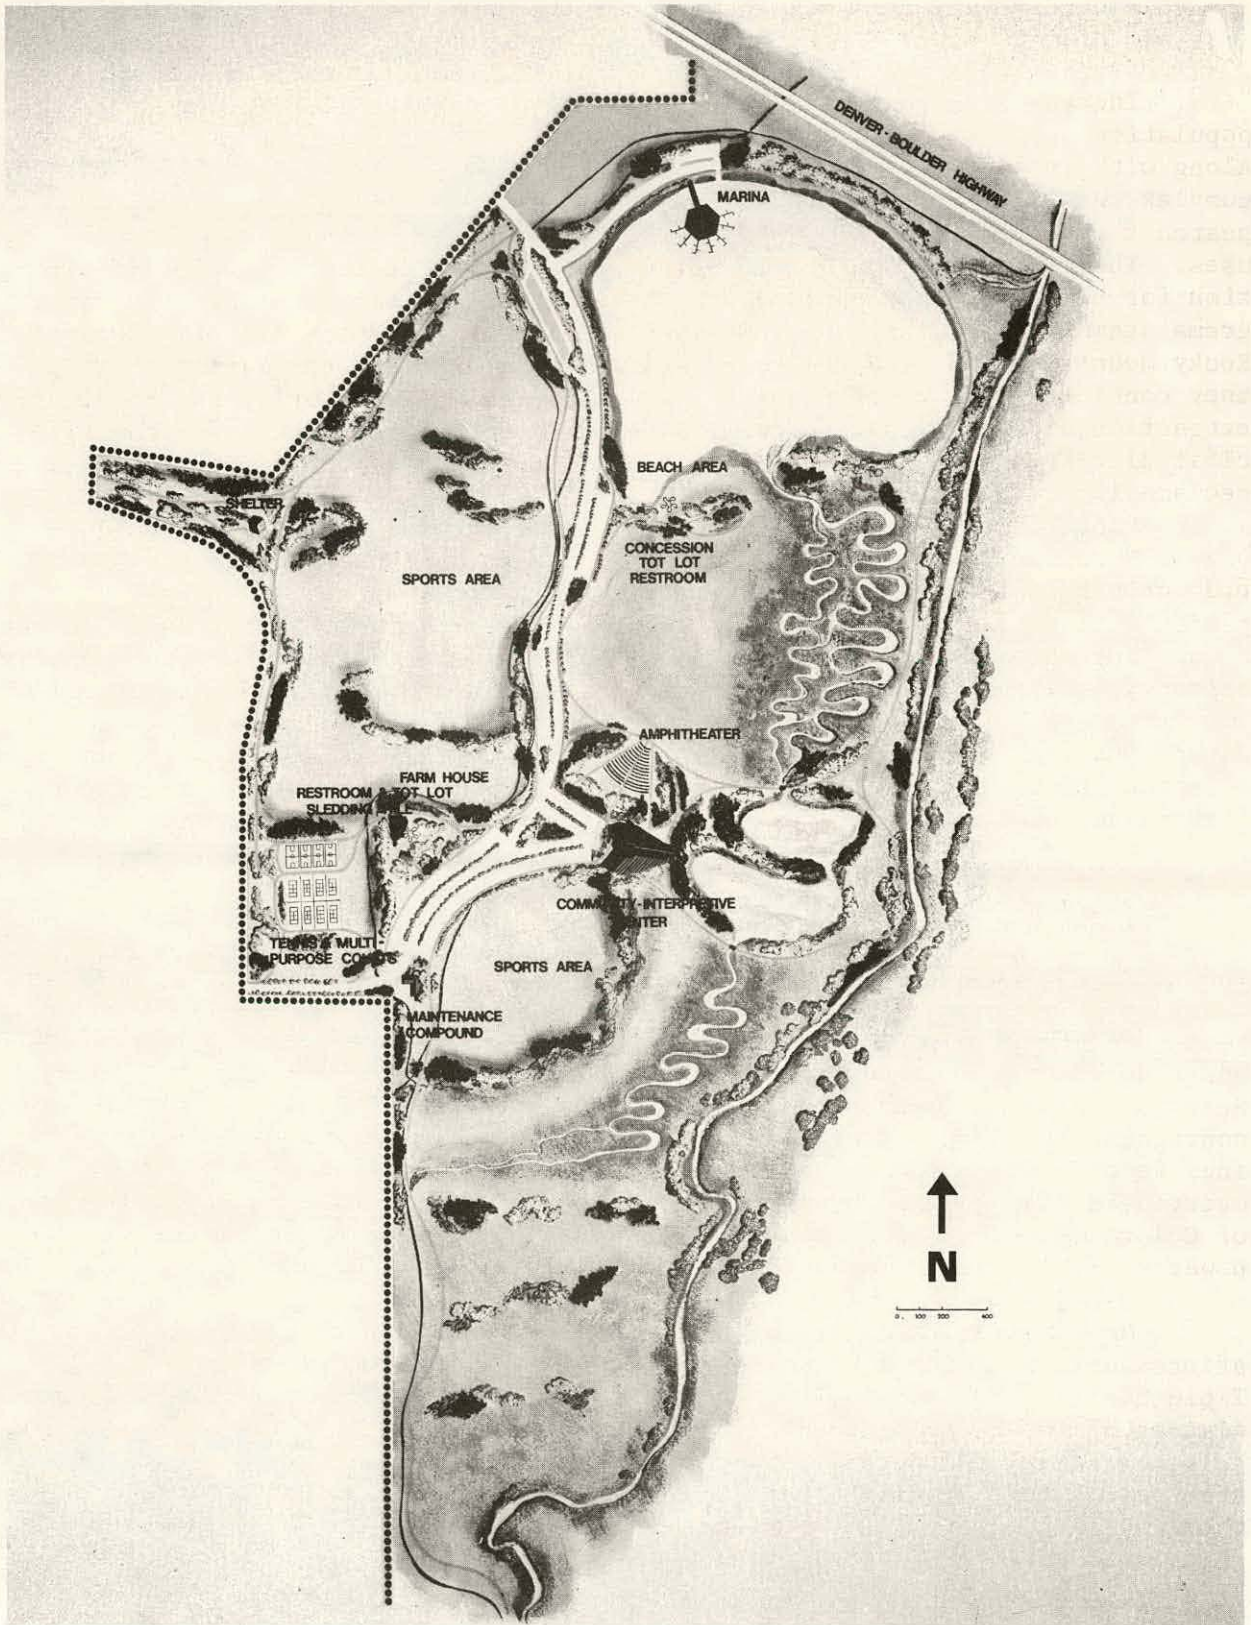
Park Development Plan, South Boulder Creek Park Project (after EIA, 1975)
